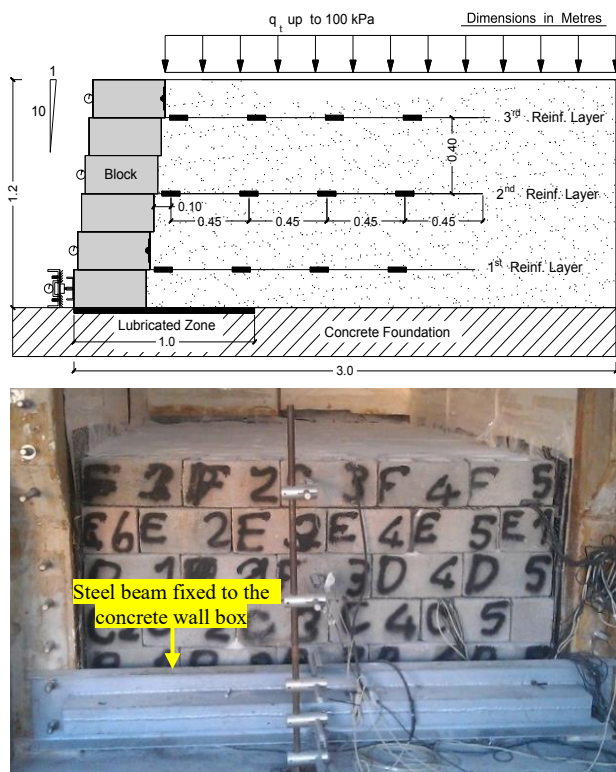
A cross-sectional view of a block-face wall and a front view of Wall 1 at the end of construction.
